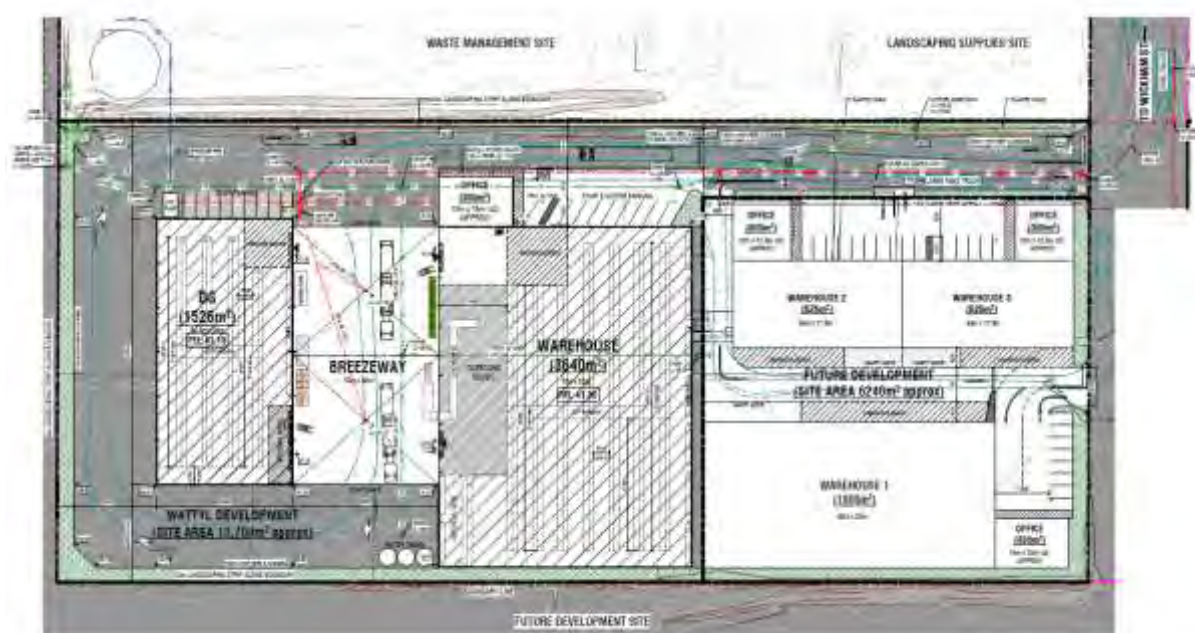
Proposed Site Layout (Prepared by Stiffe Hooker)
